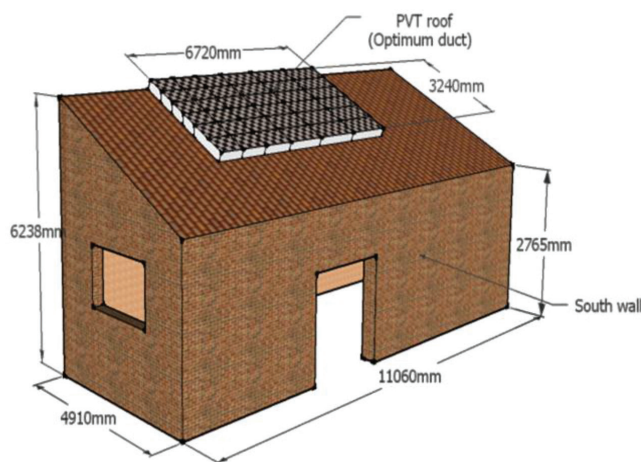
Perspective view of proposed BIPVT system installed at the roof of a building.
